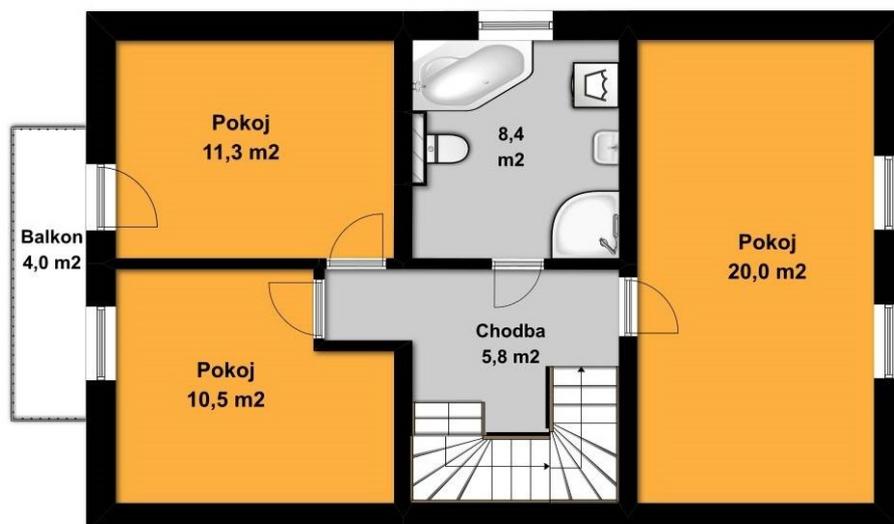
House blueprint, 2<sup>nd</sup> floor [44]
